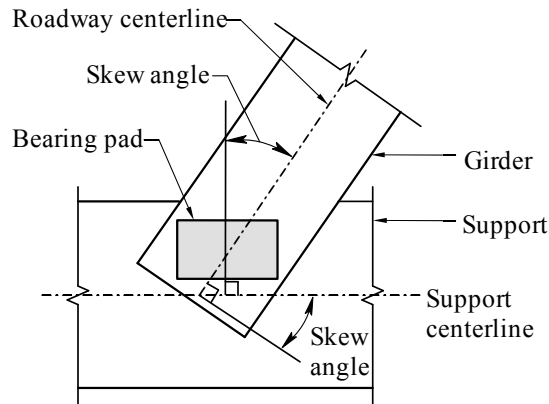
Plan view of girder, pad, and support with skew angle defined
